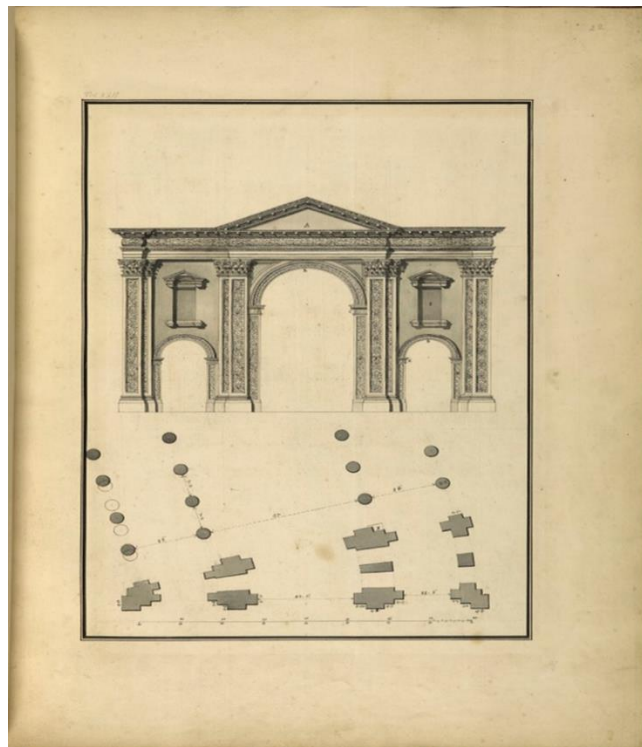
Reconstruction of the plan and facade of the east side of the Monumental Arch of Palmyra, Syria (Author: Borra, Giovanni Battista, London, 1753)
